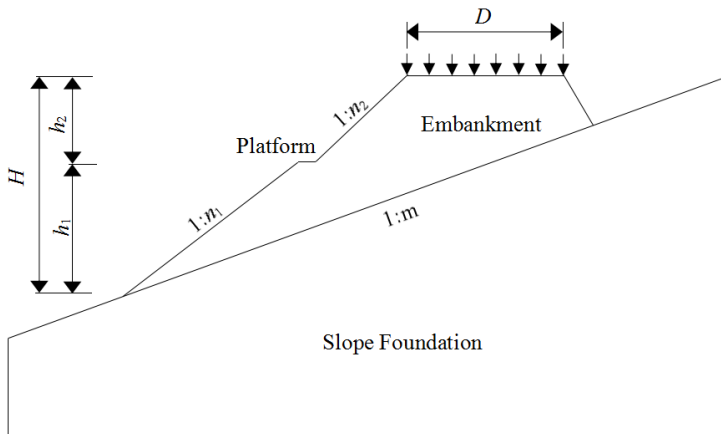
Schematic diagram of geometric model of high fill embankment on soil slope foundation
